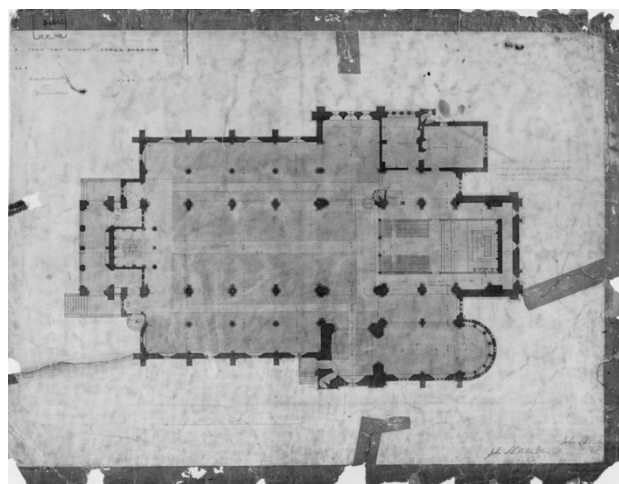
St John the Evangelist, Norwood, Architect's signed plan 1878 (onsite)
